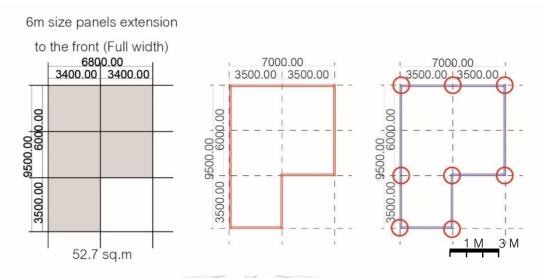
The selected "maximum 6m size panels with extension to the front – full 6800mm width" and their adjustment to achieve a more modular approach.
